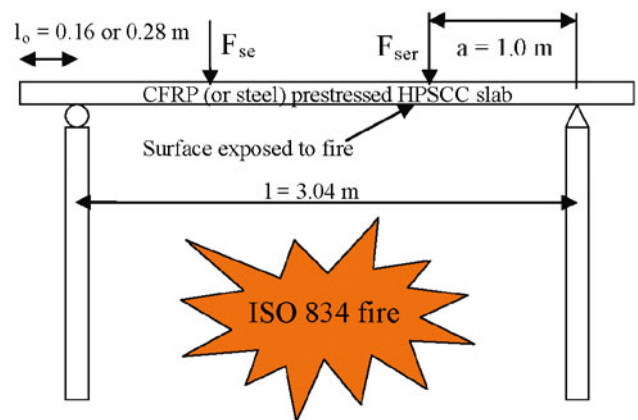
ISO 834 fire test setup for CFRP or steel prestressed HPSCC slabs under service load (F_{ser})
